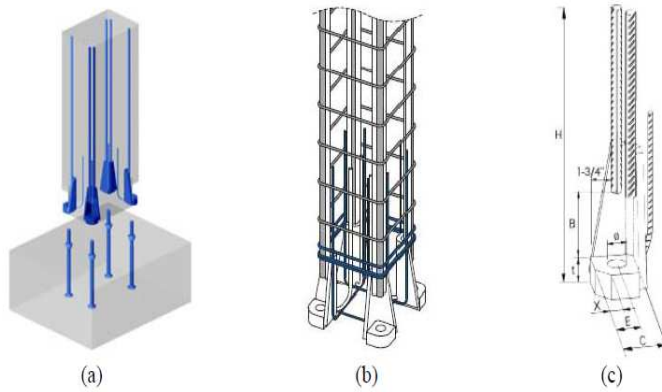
(a) Columns shoes and anchoring bolts in column connections; (b) details for additional steel reinforcement in square columns (welded bars and lap splice along with the height); (c) a single type of shoe
